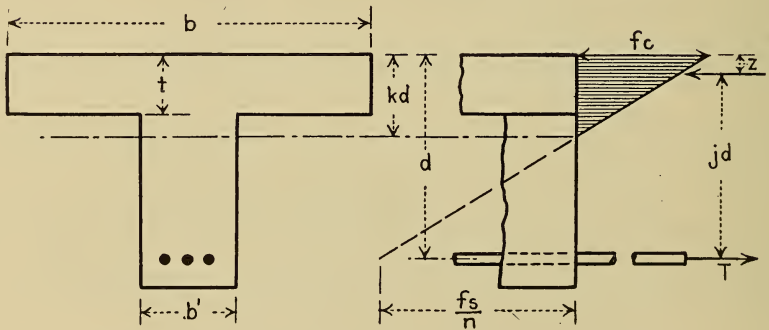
Nomenclature for Reinforced Concrete T-Beam.
